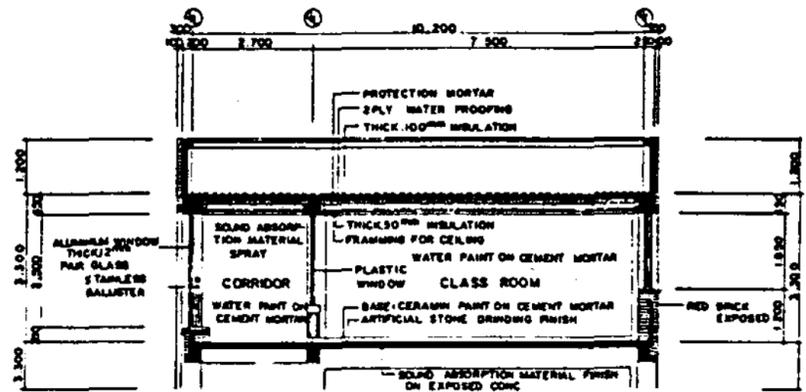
Main Section Detail (Passive Solar School Classroom)
